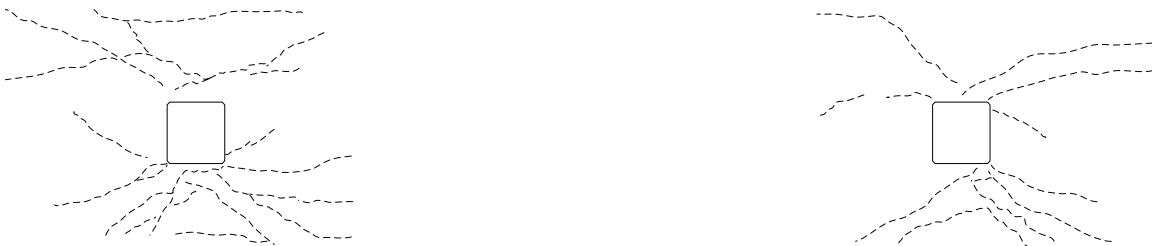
Level 3-2A and 2B Bottom Slab Cracks (South 1.5% Roof Drift)
